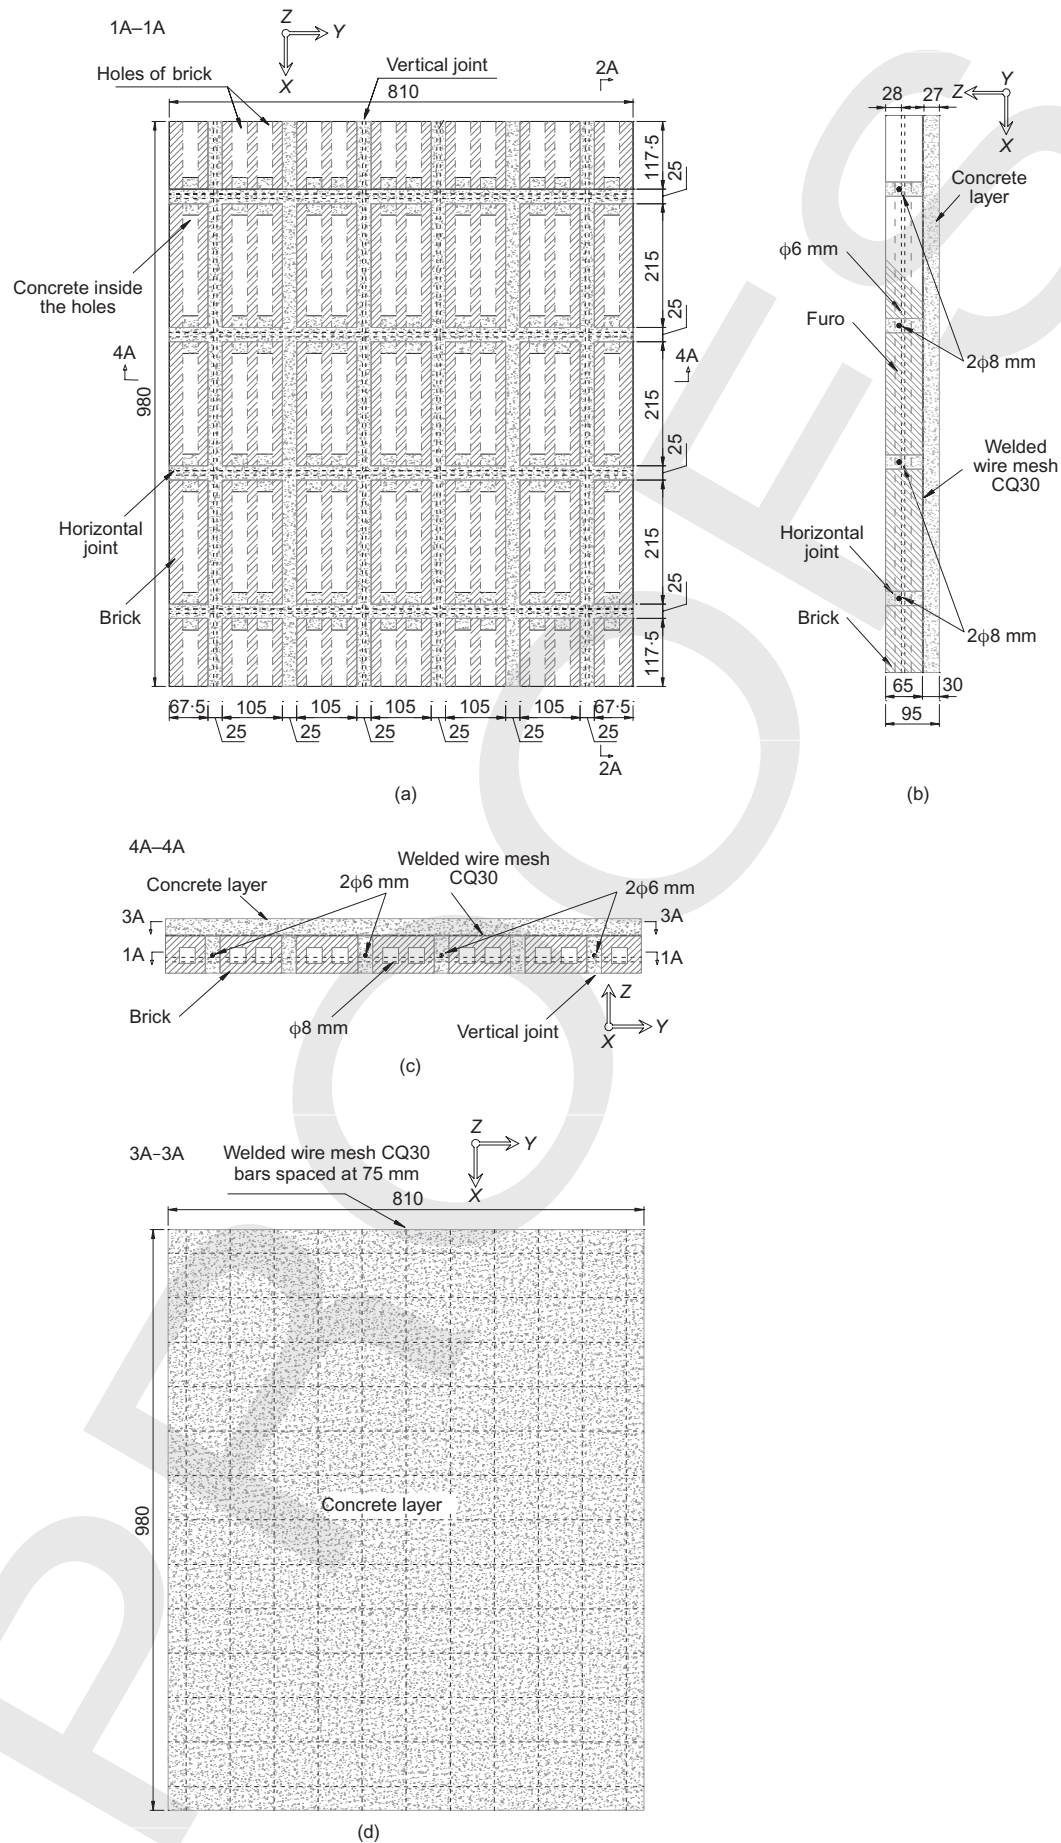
Specimen configuration: (a) plan, (b) joints and steel bar positions, (c) vertical cross-section, (d) concrete layer and welded wire mesh
